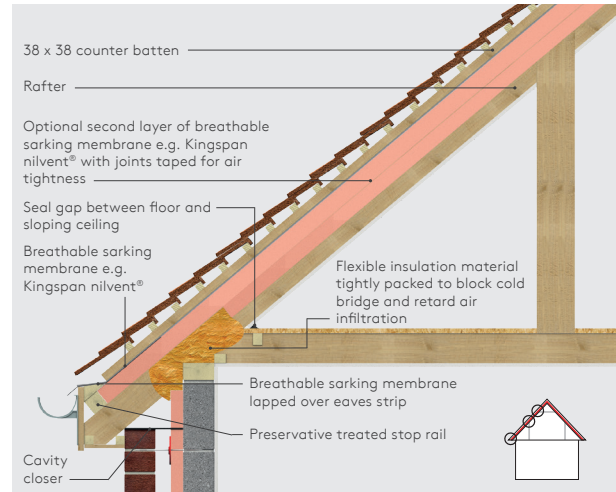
Overhanging eaves detail - section perpendicular to ridge
